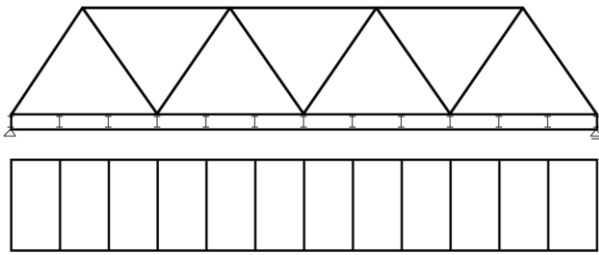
Layout of through truss bridge with rigid lower chord: longitudinal section (top), plan (bottom)
